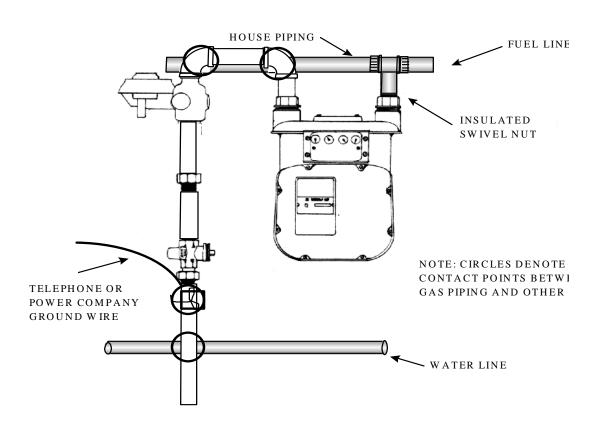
Typical Meter Installation Accidental Contacts (Meter Insulator Shorted Out by House Piping, etc.)
